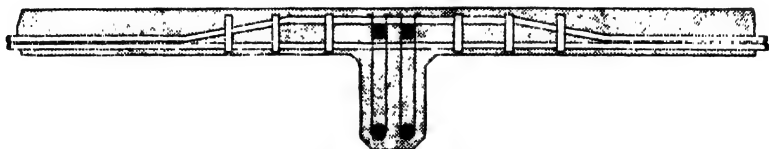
Beam and Slab Construction. (Mouchel-Hennebique System.)
